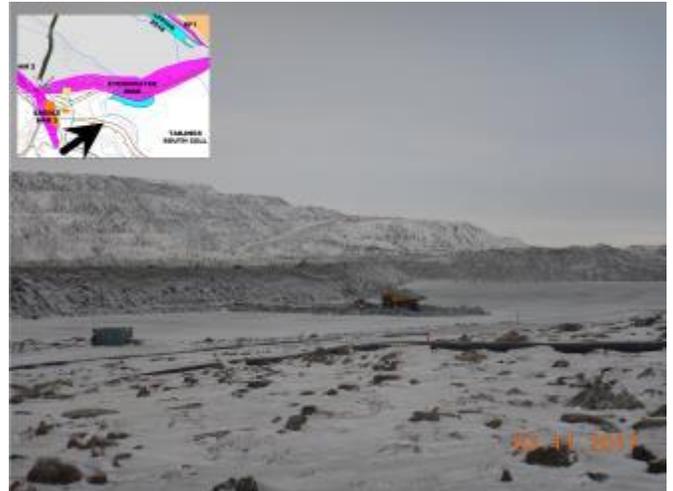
Placement of rockfill over 2016 Stormwater Dike buttress (October 9, 2017).
